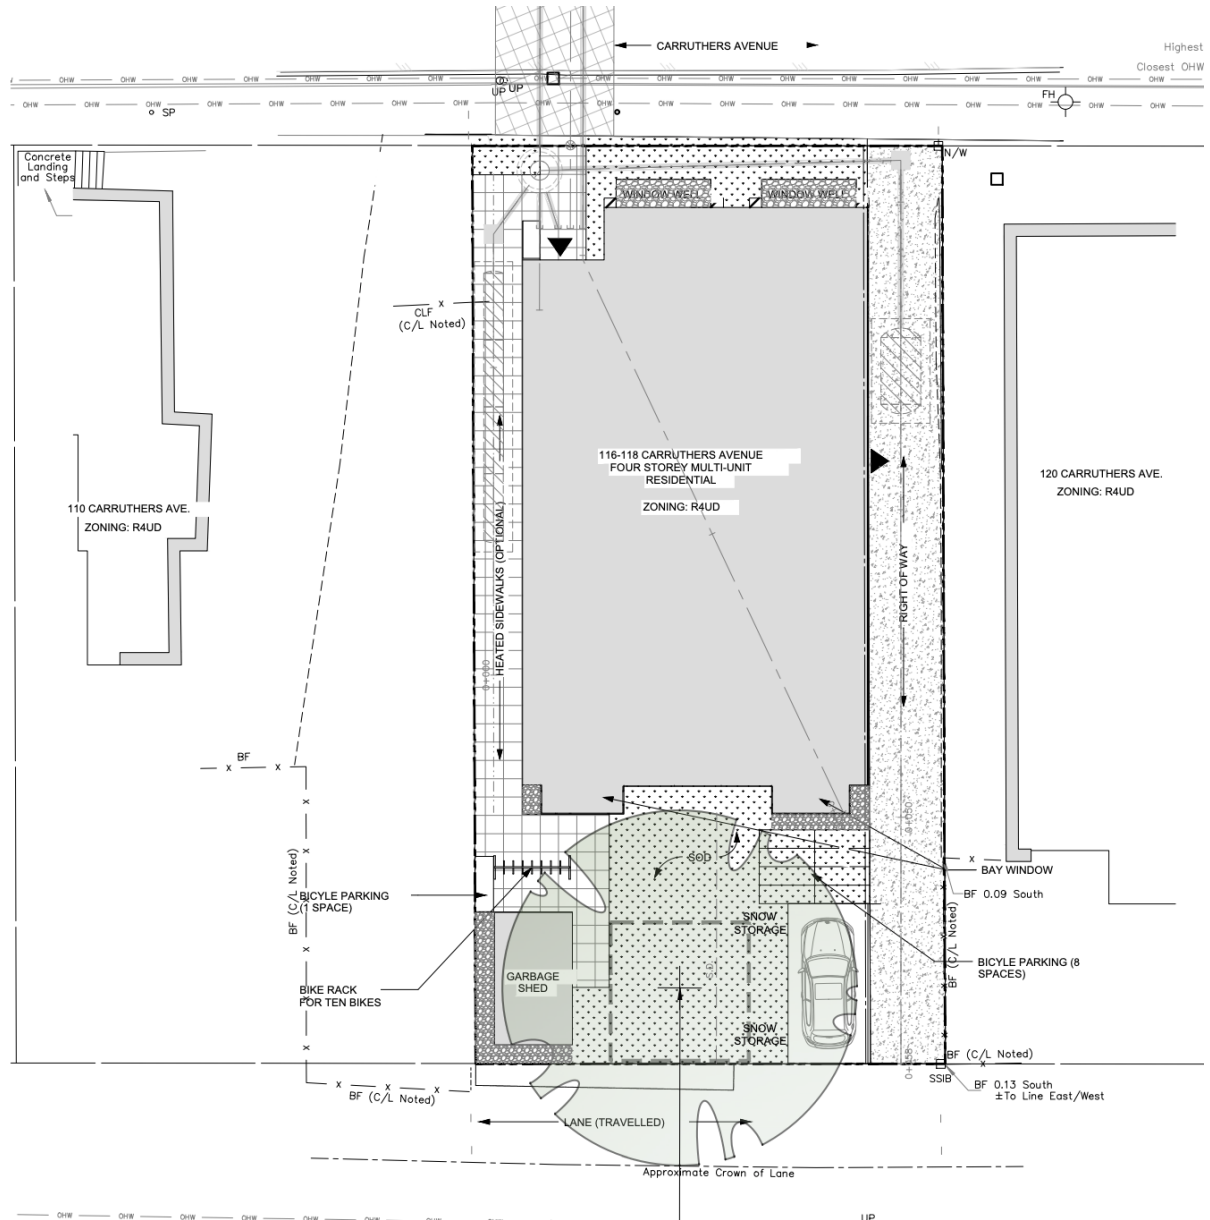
Extract of Site Plan with Landscape Plan (Source: Redline Architecture & JB Lennox Landscape Architects)
